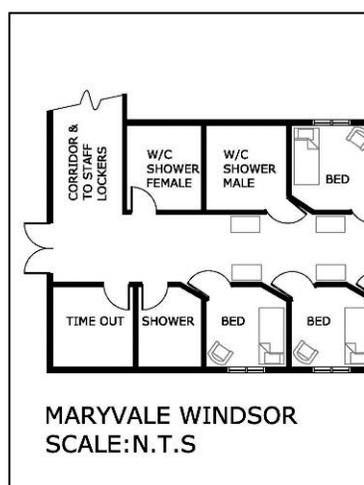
Maryvale floor plan illustrating the shower area and the adjacent corridor where staff wait for the patients to return. (See Appendix A for full floor plan).
